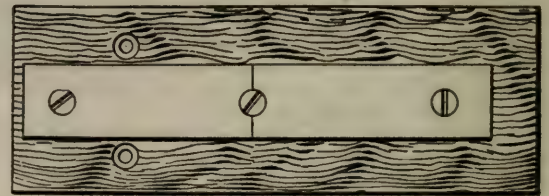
The Weber Joint; Steel Splices. The Rail Joint Company.
